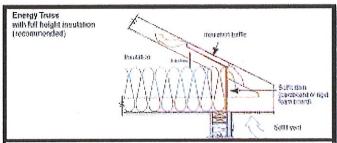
Raised heel (energy) truss with attic space. Source: Attic Eave Minimum Insulation | Building America Solution Center (pnnl.gav)
